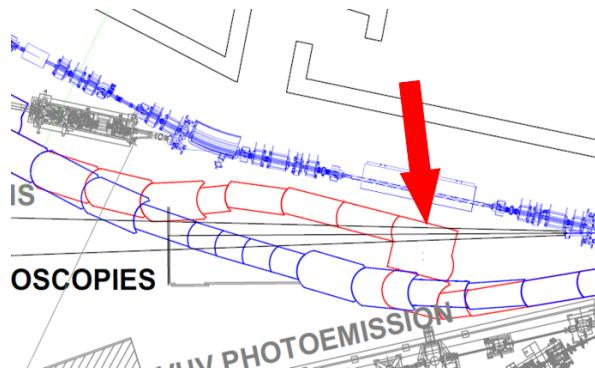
Outer wall reconfiguration for beam-exit 4.1.
